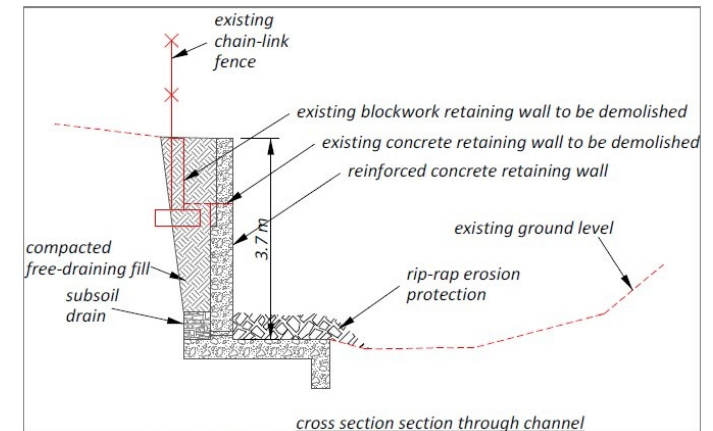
Retaining Wall at Wine Processing Factories
